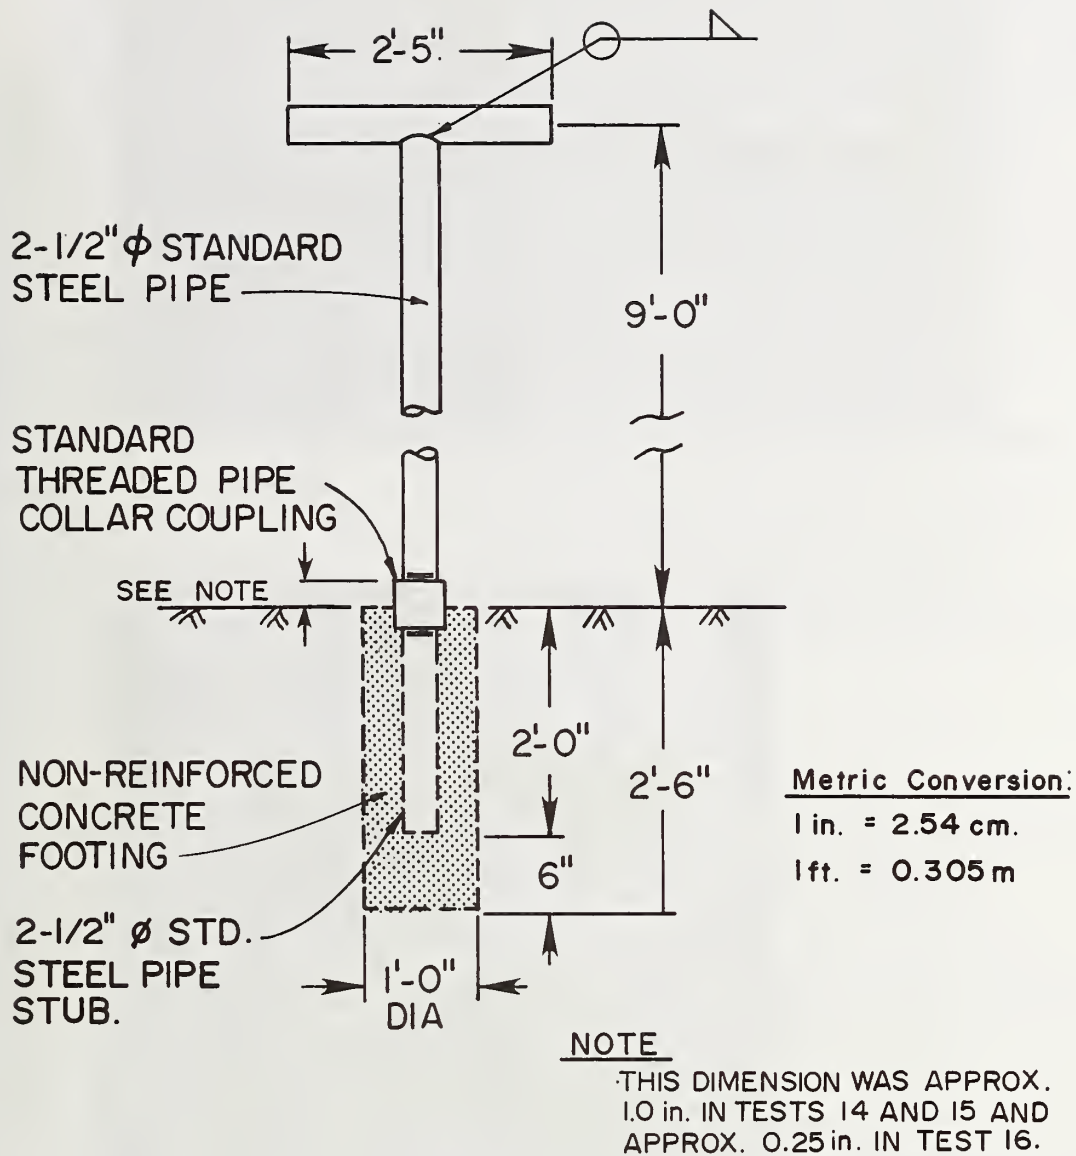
Steel pipe with breakaway coupling, tests 14, 15, and 16.
